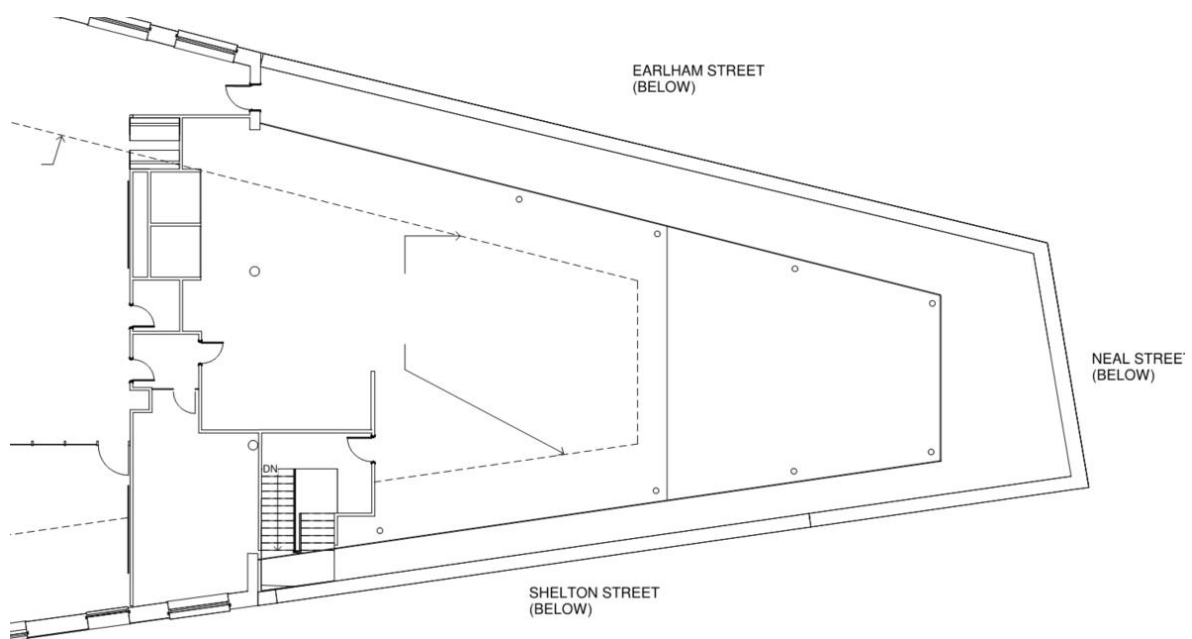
(above): Existing 5<sup>th</sup> floor plan
